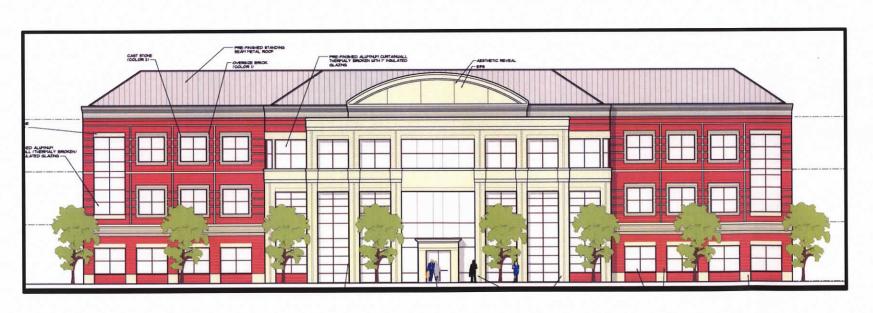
EXHIBIT B – PAGE 2 MOB & OFFICE ELEVATION EXAMPLES
